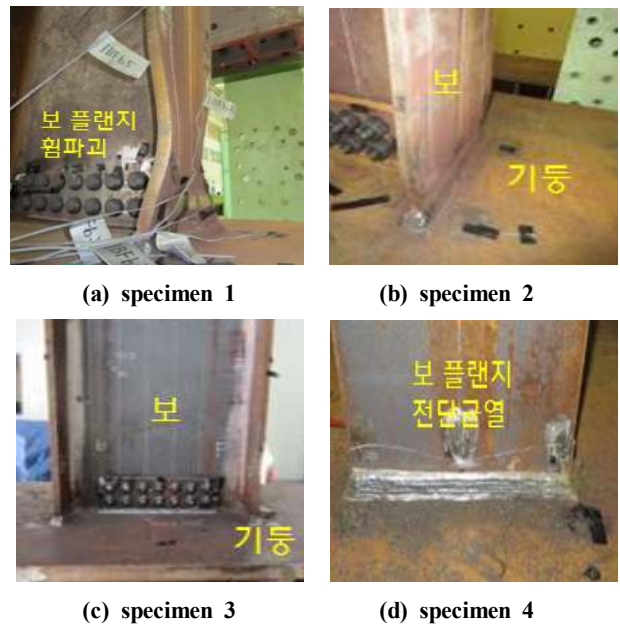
Failure Shape of Beam-Column Connection
